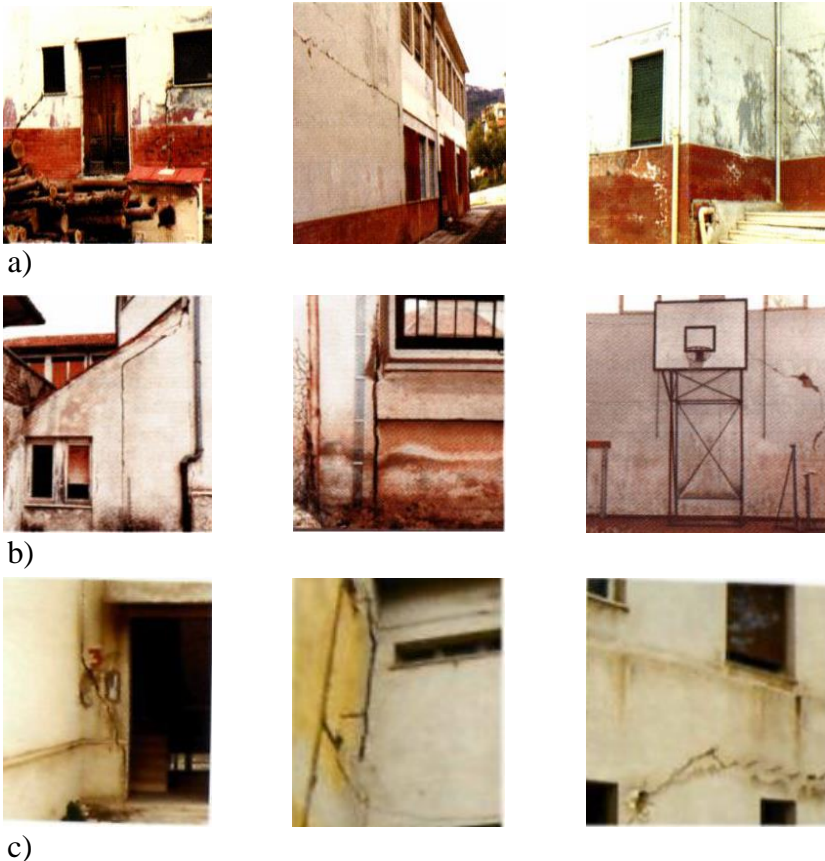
San Pietro in Guarano (Italy) landslide in 1981 as reported in (Antronico *et al.*, 2003). Damage suffered by (a) a primary school, (b) a secondary school and (c) a private building subjected to the landslide.
